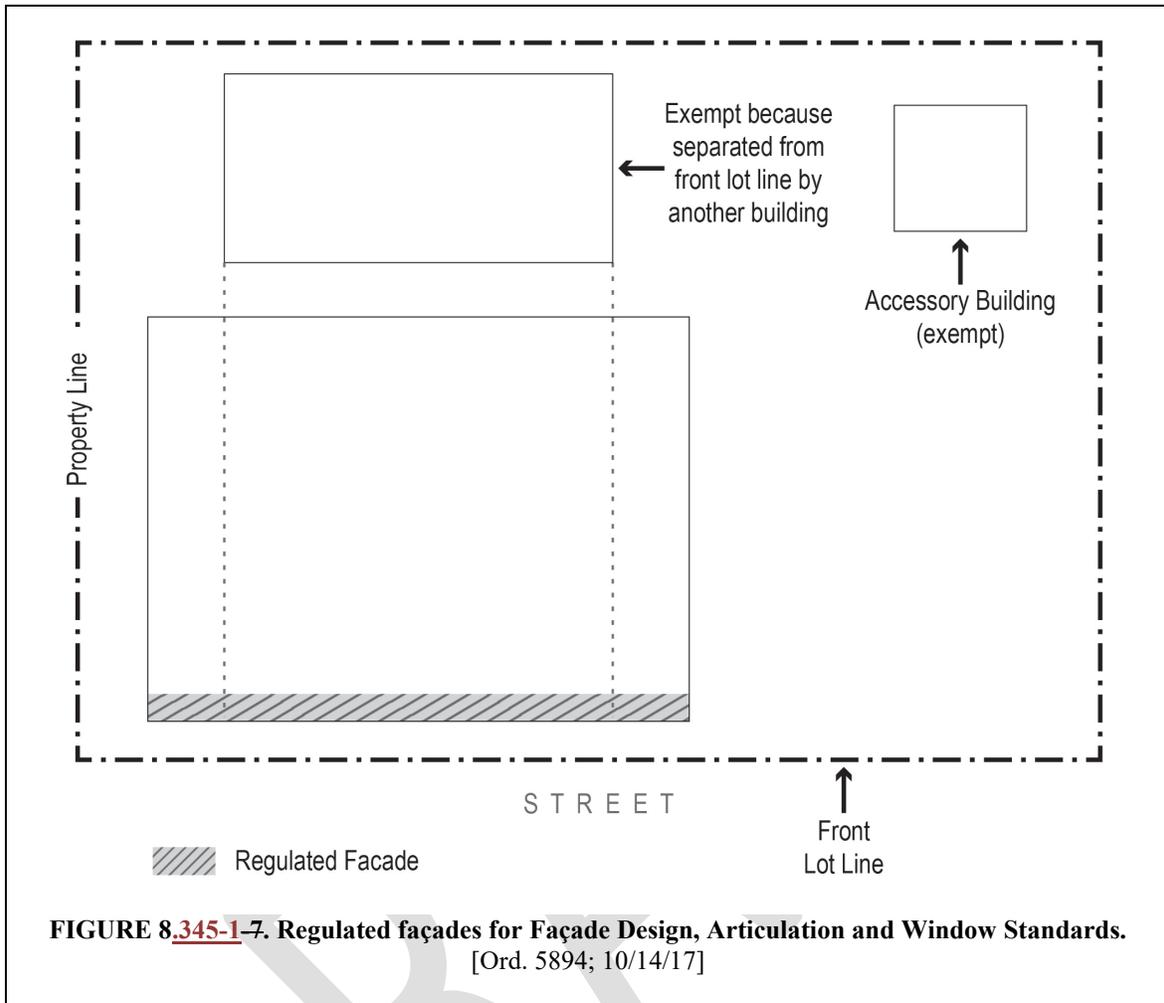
Regulated façades for Façade Design, Articulation and Window Standards.
